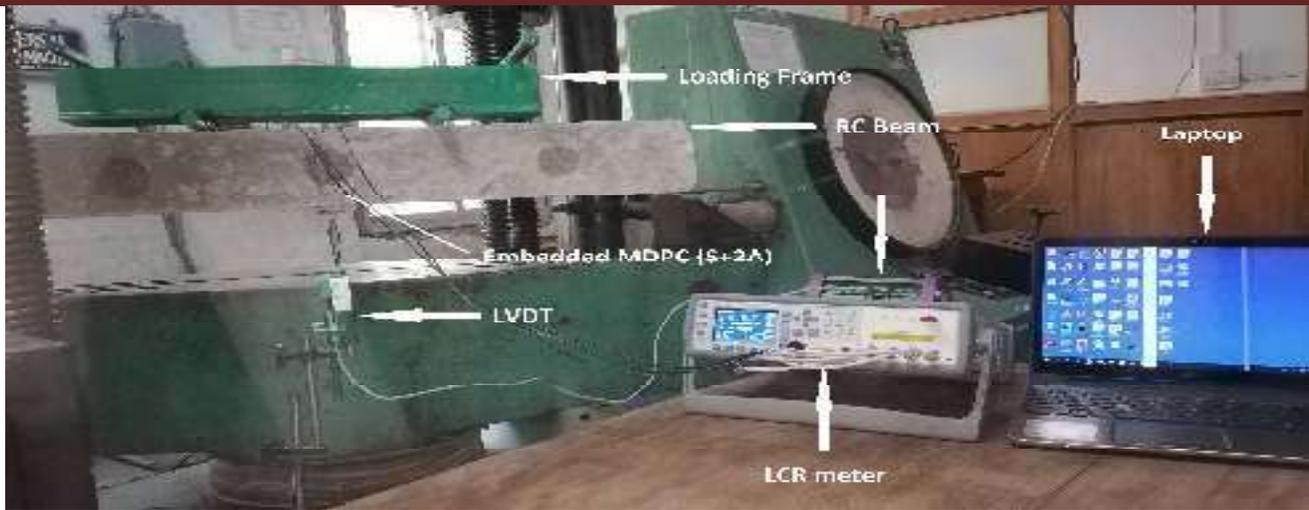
Experimental Setup of RC beam of Universal Testing Machine
